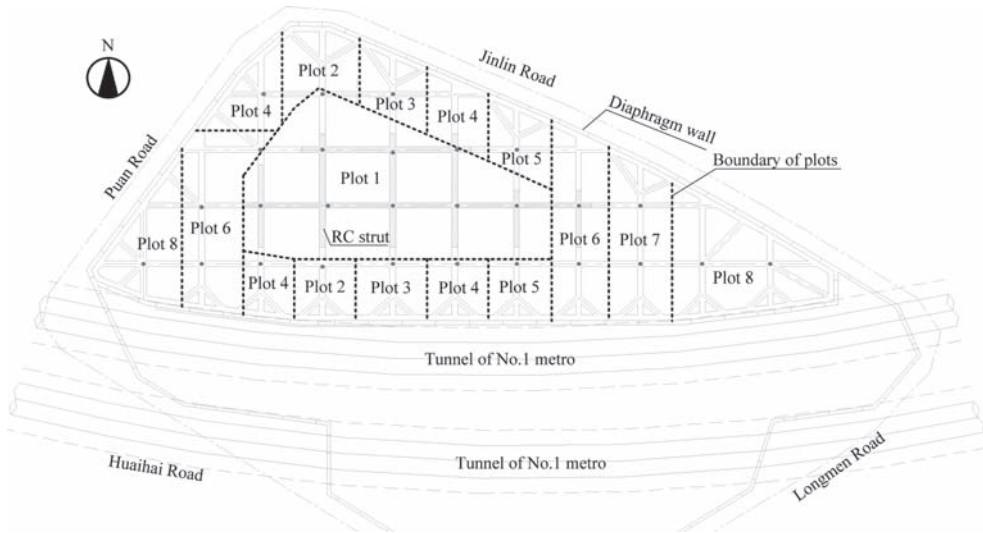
Plane view of the plots of the excavation of the Shanghai Square project (according to Liu and Wang, 2009).
